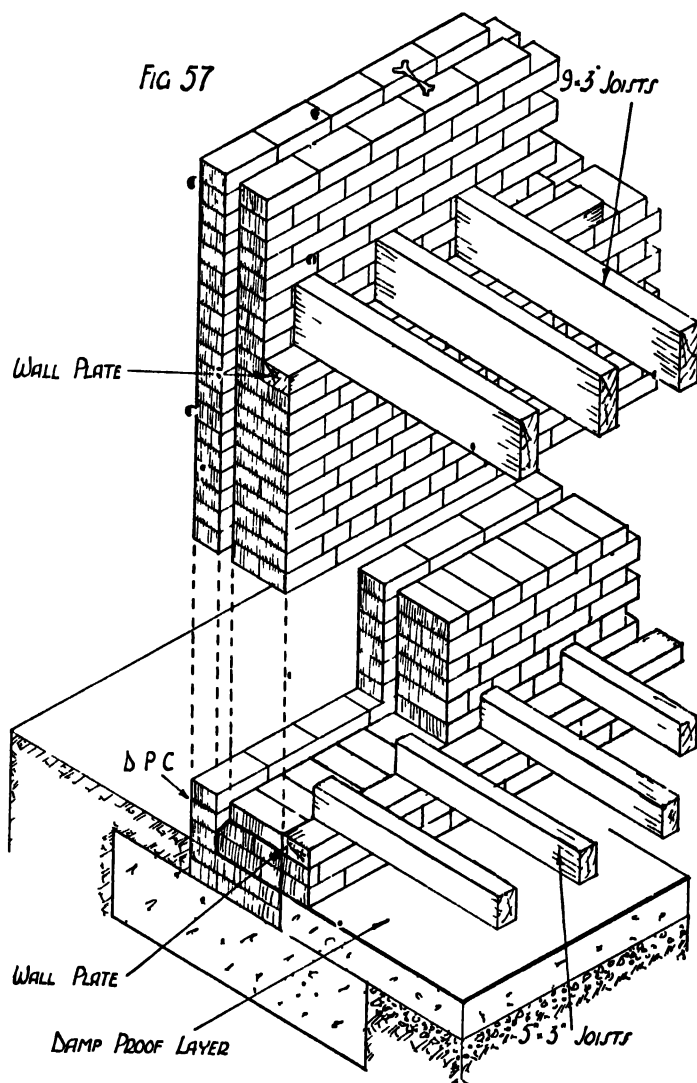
CAVITY WALL - FLOOR CONSTRUCTION
